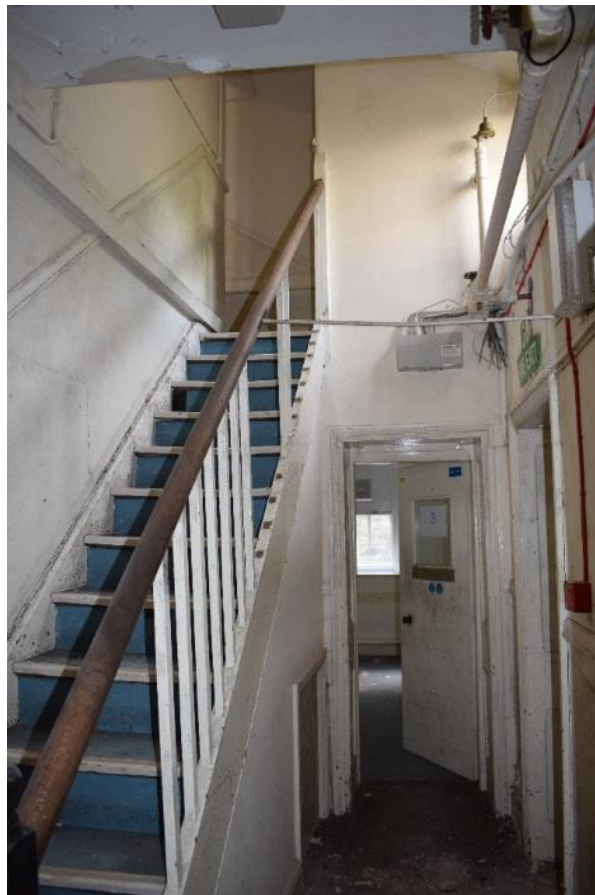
The stairs accessing the first floor of the western extension (Fig. 11, G12). CPAT 4537-0144
